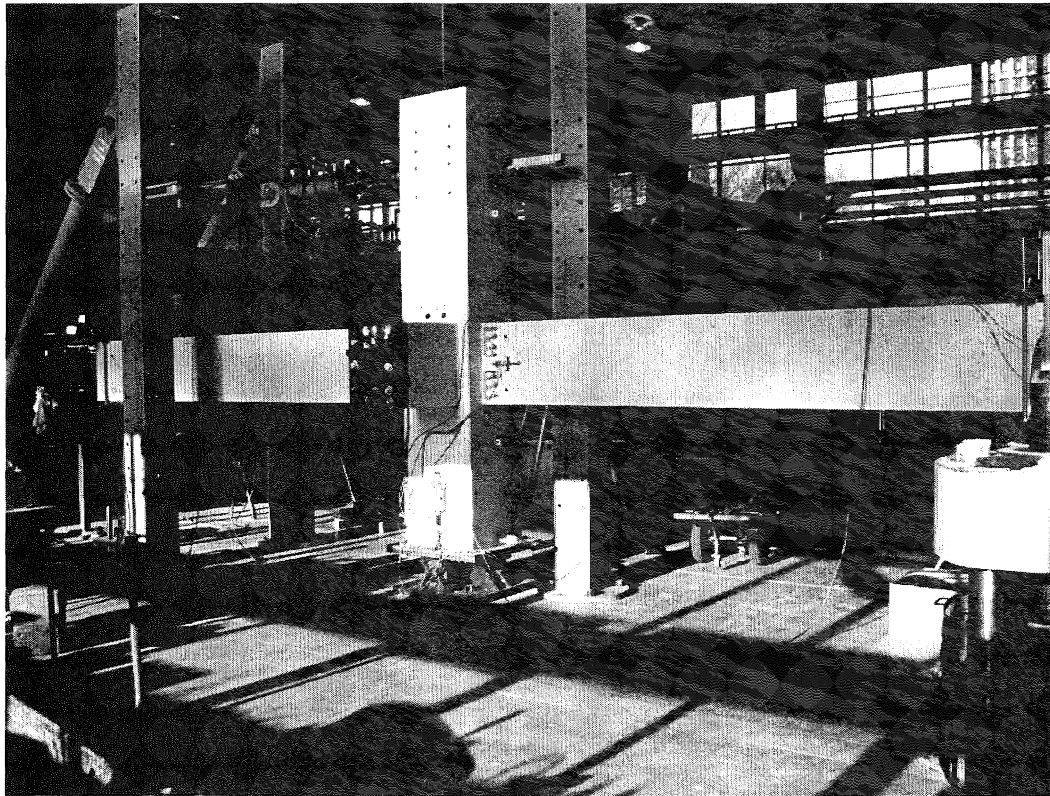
Beam-column subassembly with armoured beam-end dry-joint connections designed in accordance with the principles of damage avoidance.
